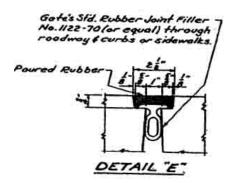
Bridge 5/227 Expansion Joint Detail
